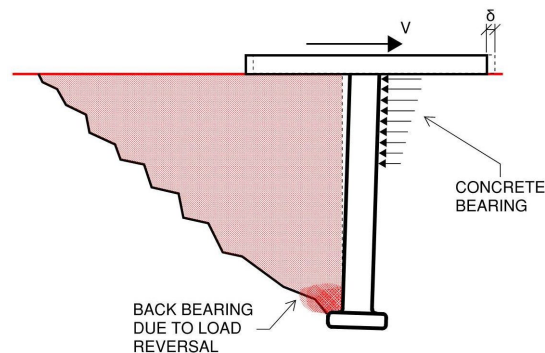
concrete pryout mechanism in headed anchors (adapted from Anderson and Meinheit (2005))
